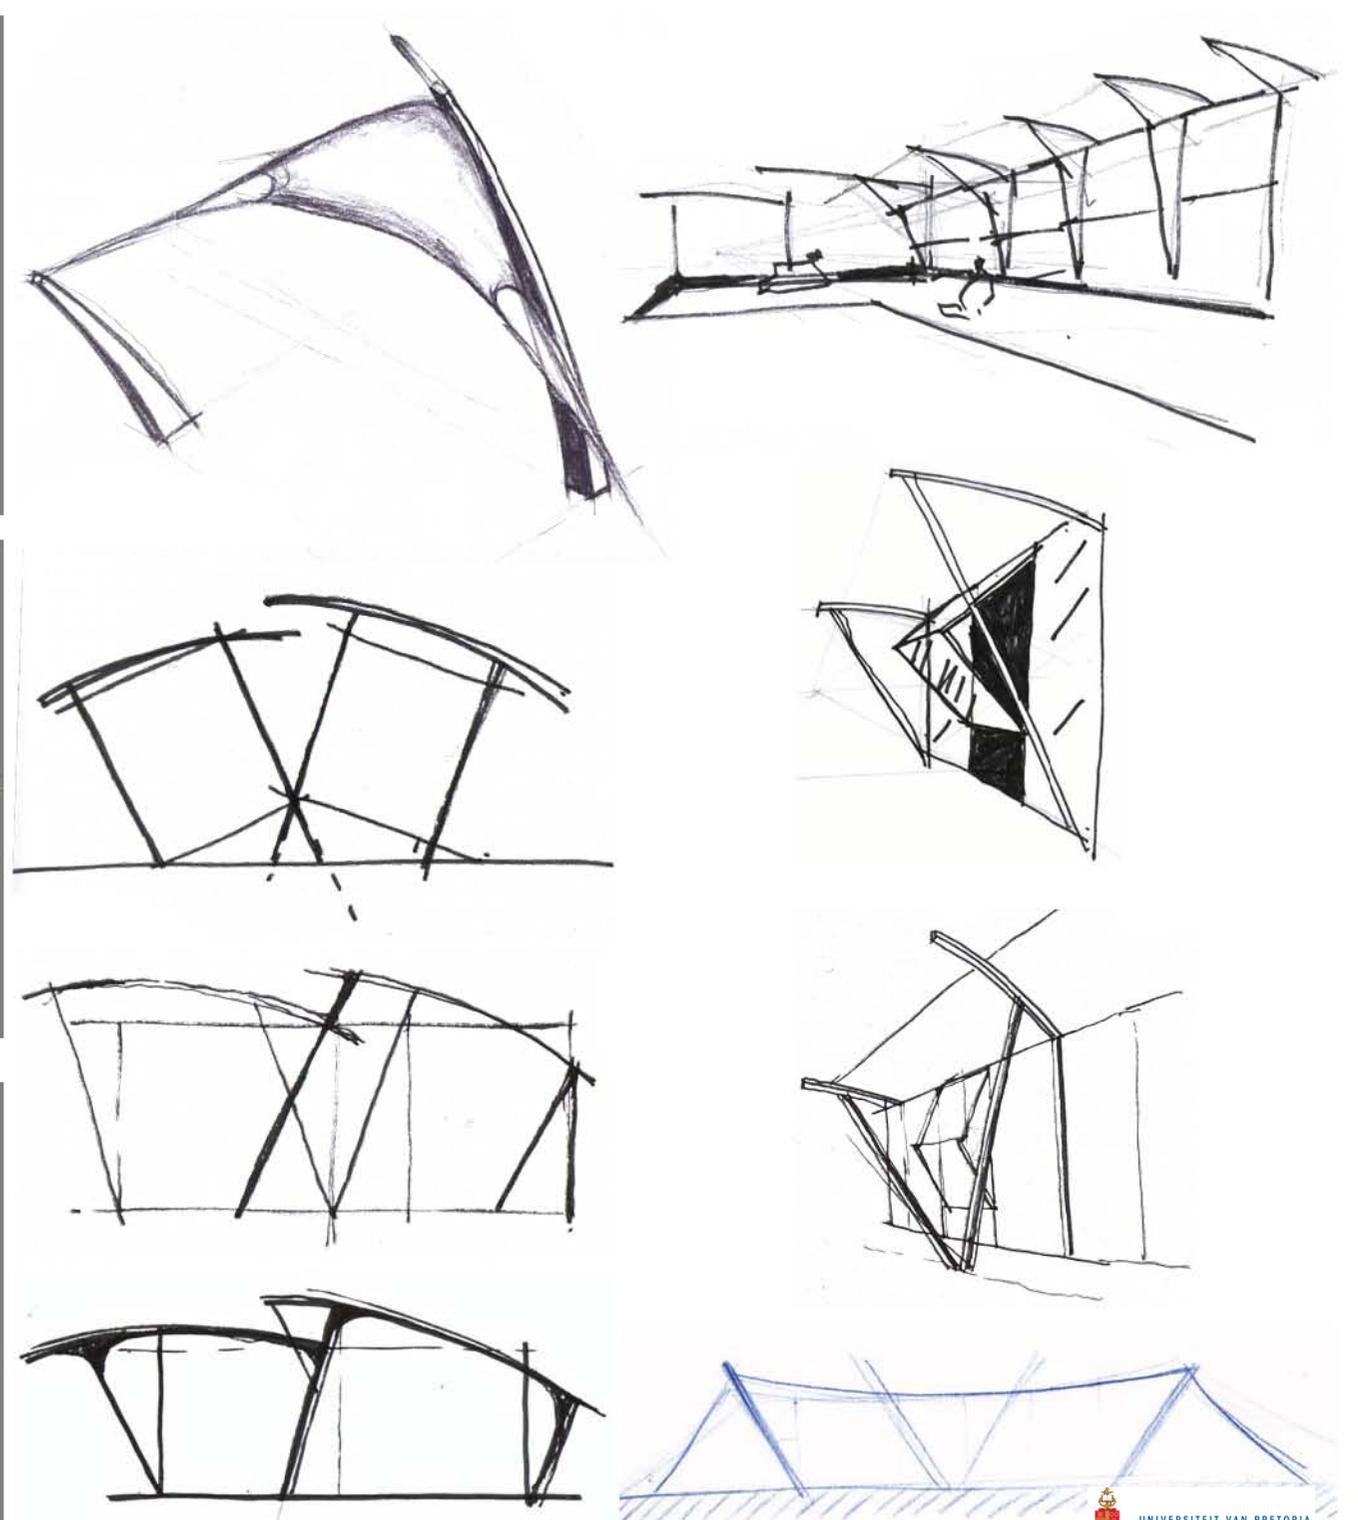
Exploring facade and section details of tensile structure. Deriving a language for structural support that can integrate with mechanical facade elements like ventilation panels etc. September 2008
